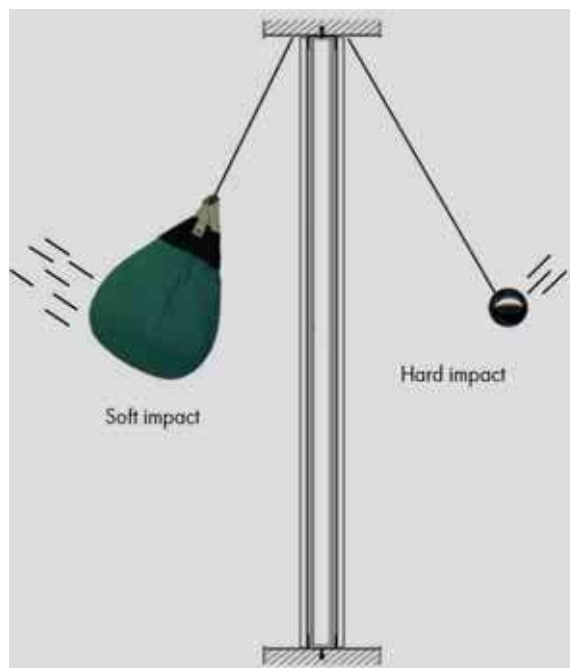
Hard and soft impact test for applying impact-type loading to partition walls
